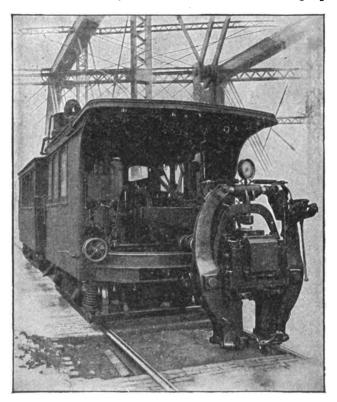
Electric Rail Welder and Car Courtesy of Lorain Steel Company
